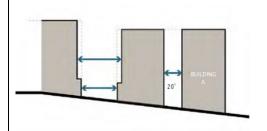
Building separation between Buildings A and B and between multiple structures in same buildable zone
